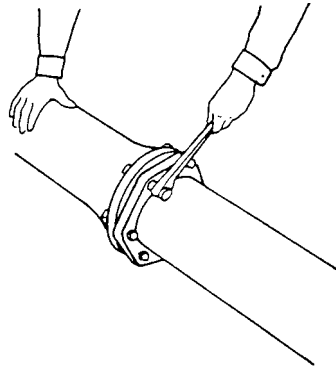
MECHANICAL JOINT ASSEMBLY
